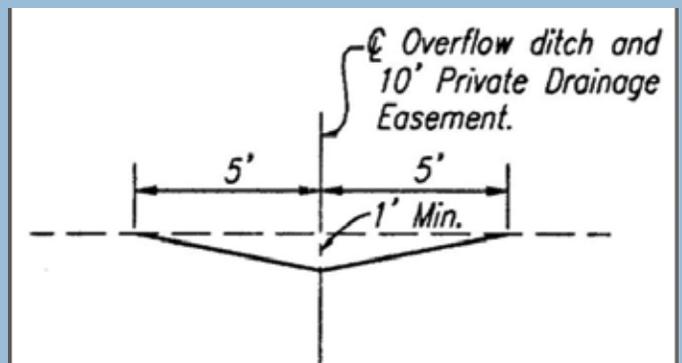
Cross section of typical residential drainage swale along a common property line.
